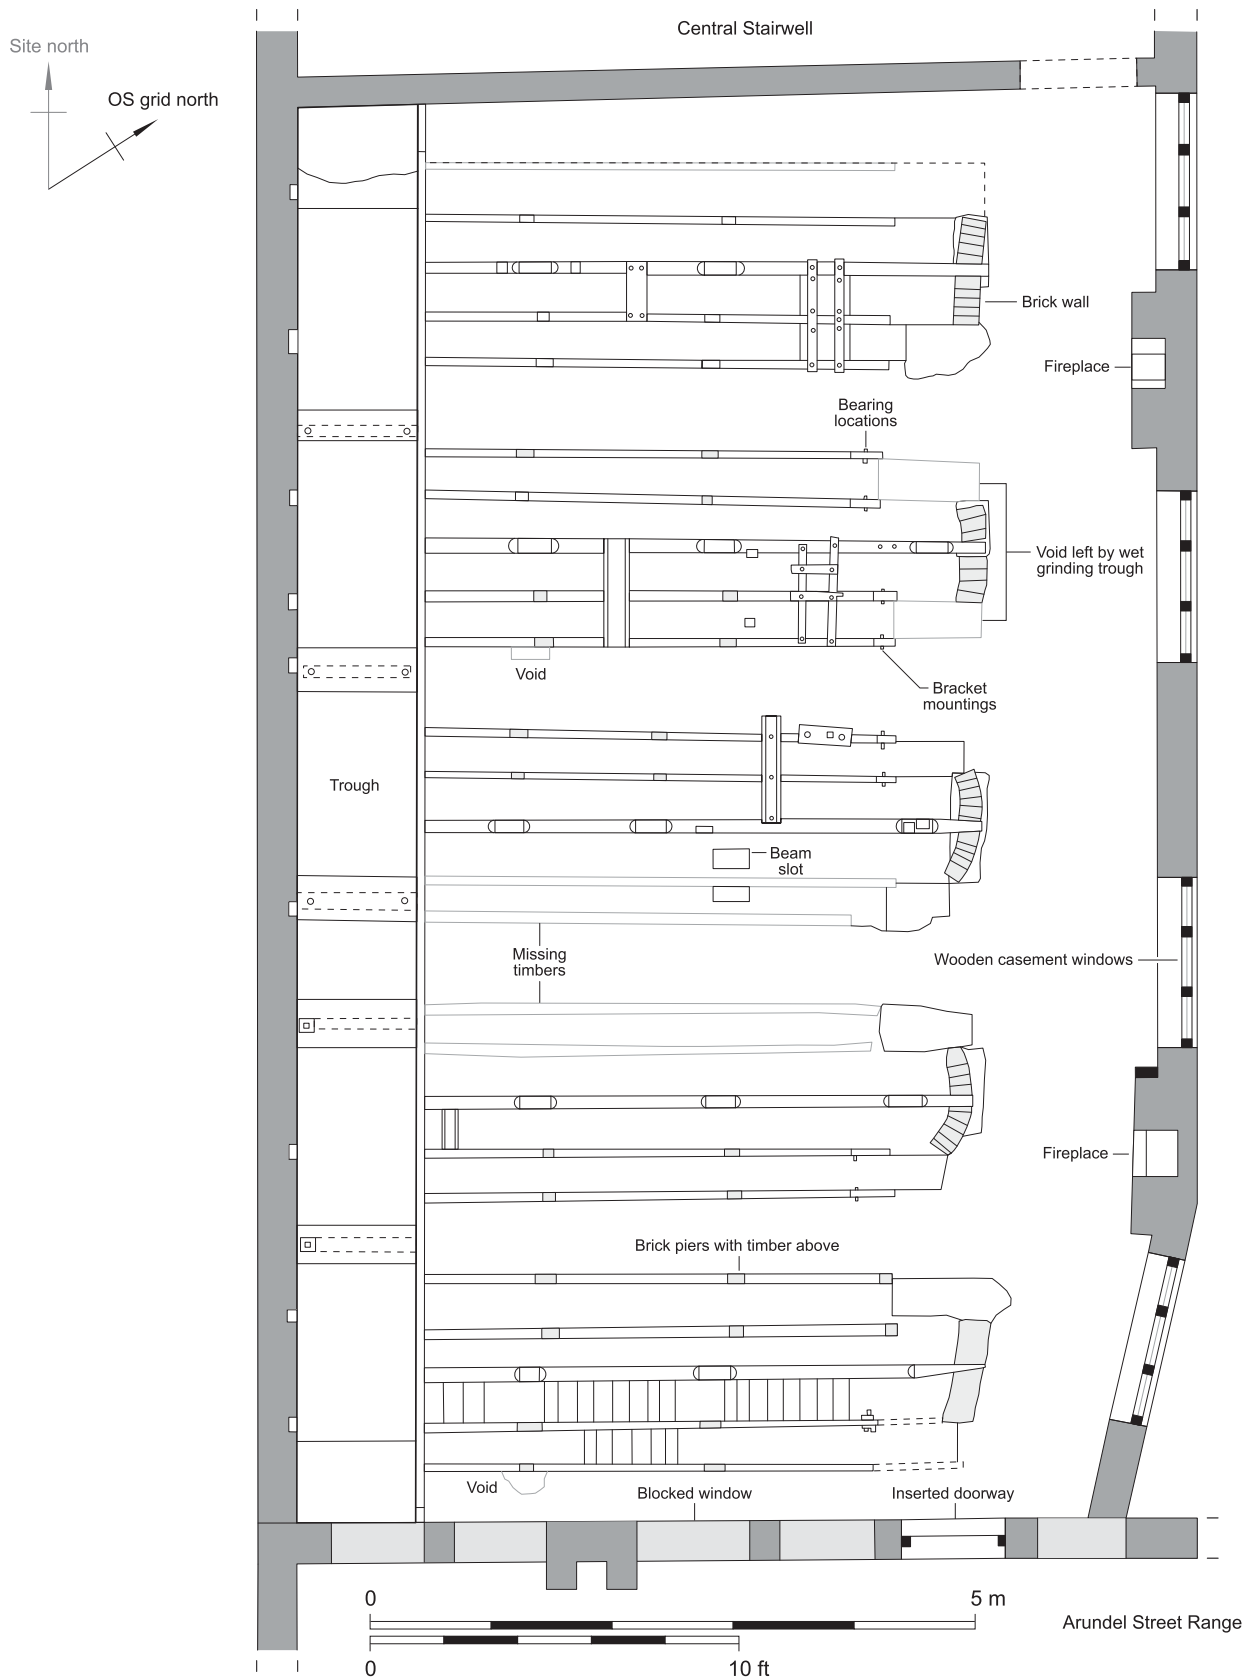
Floor plan of south grinding workshop with wooden troughs, second floor, West range
